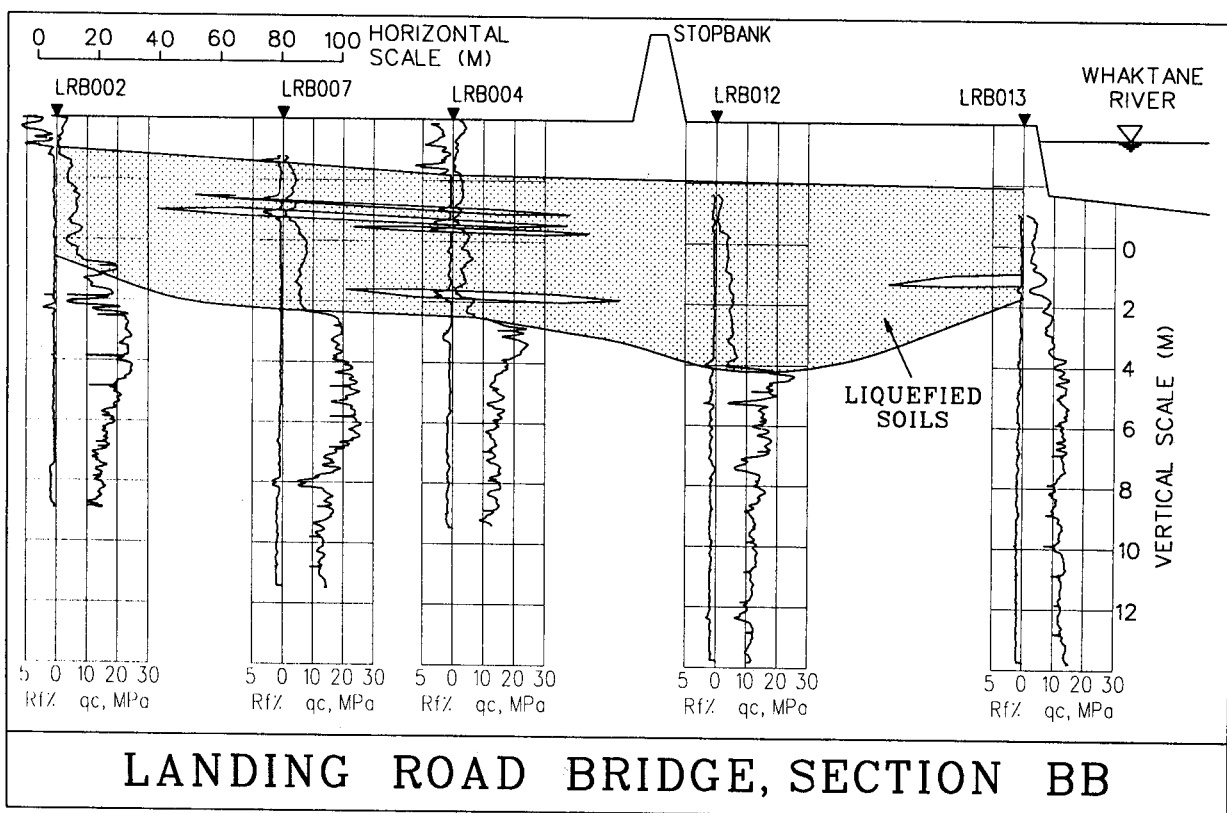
Section BB at Landing Road Bridge site showing CPT data and estimated liquefied soils.
